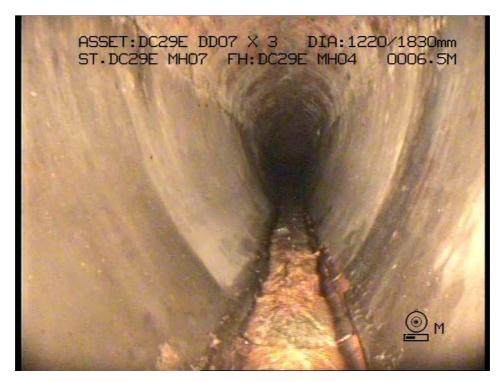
Photograph Taken Inside the Tank Stream Drainage Structure Between Access Chambers AC7 and AC4
